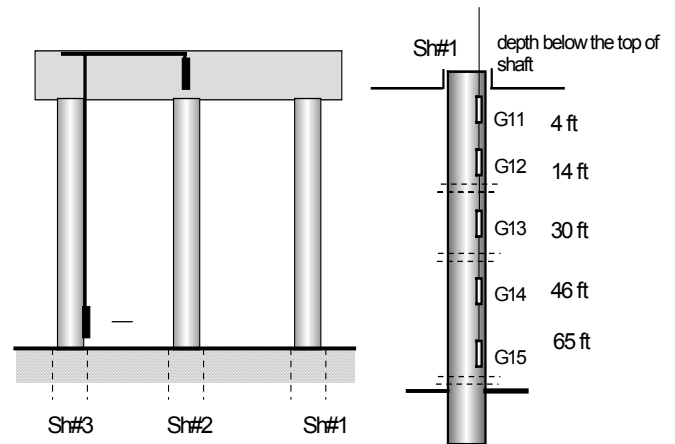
Schematics of the Instrumented Shaft at Pier 2
